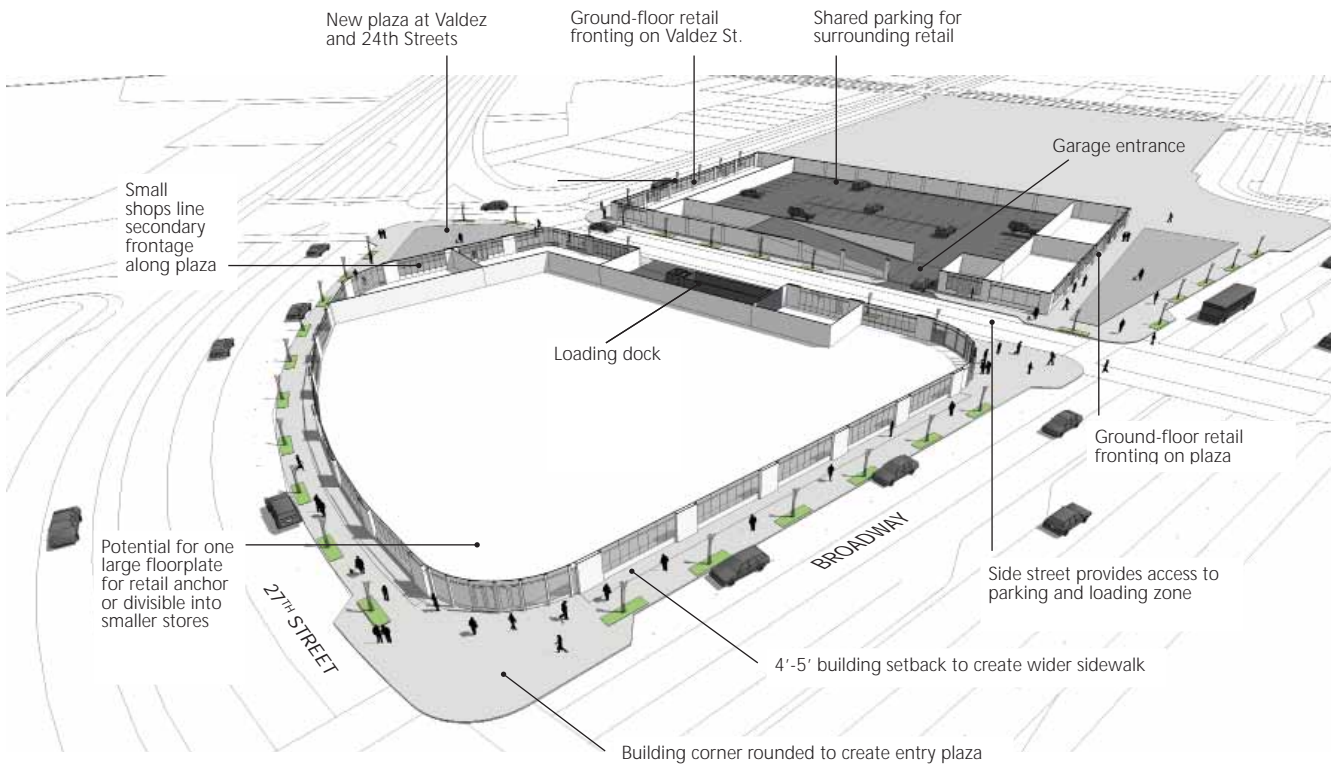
ILLUSTRATIVE CONCEPT - ANCHOR RETAIL OPPORTUNITY AREA (GROUND LEVEL CUTAWAY)
